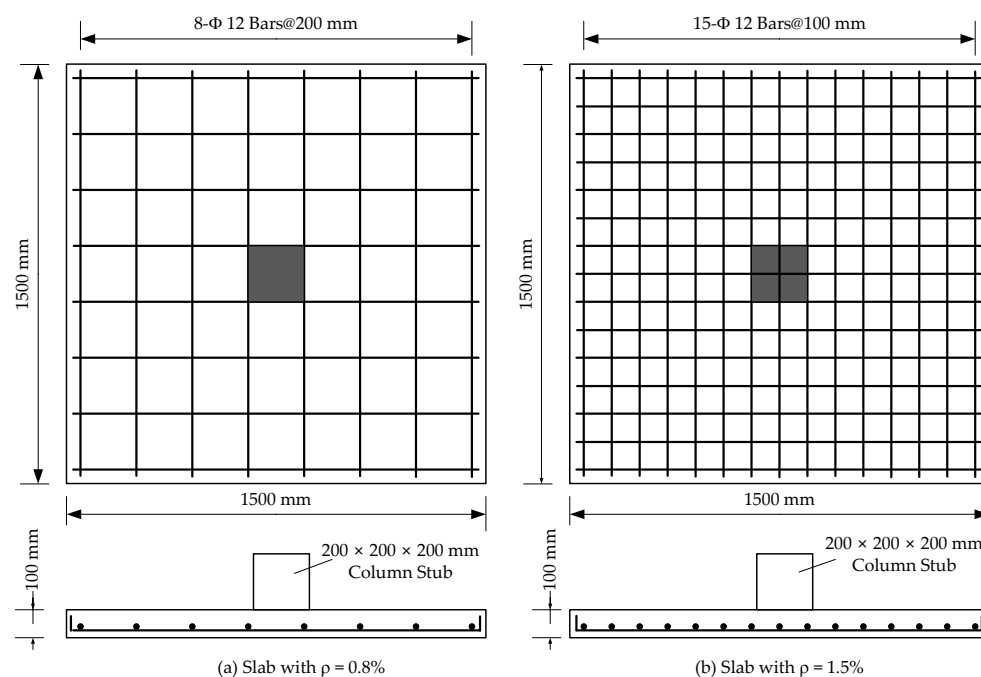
Details of reinforcement layout: (a) slabs with $\rho = 0.8\%$; (b) slabs with $\rho = 1.5\%$.
